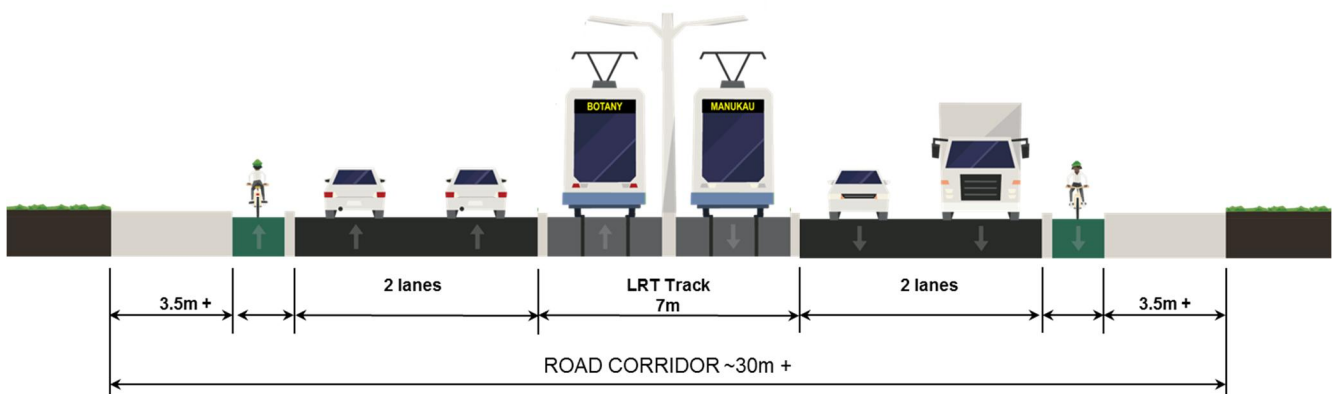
Te Irirangi Drive - typical cross section south of Whetstone Road
